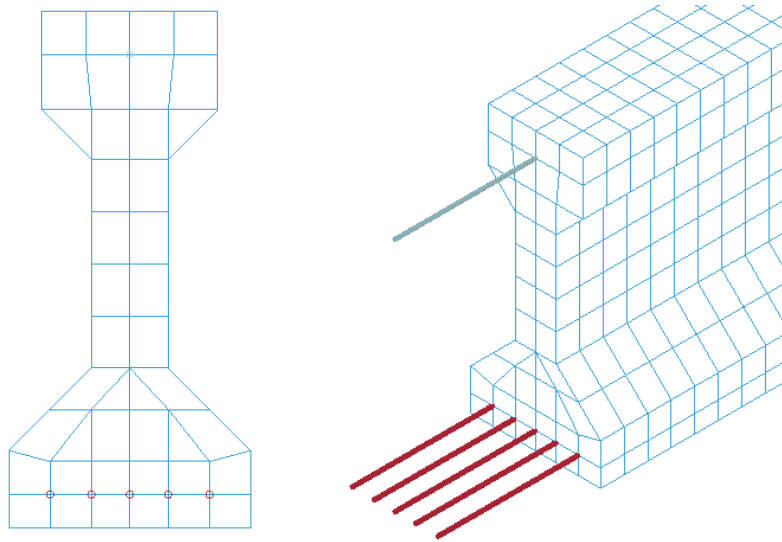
Zoom-In View of Strands at the Mid-Span of The Girder of Archetype 2 Bridge
